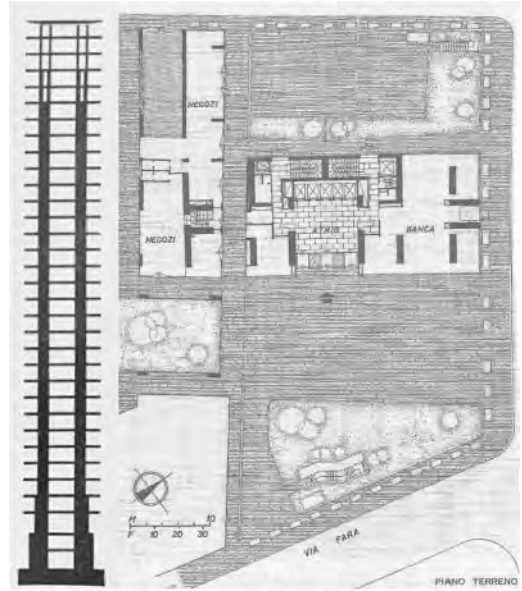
Galfa Tower. Longitudinal section and ground floor plan. (*L'Architettura. Cronache e Storia*, 1959, 6, 370, 375).
